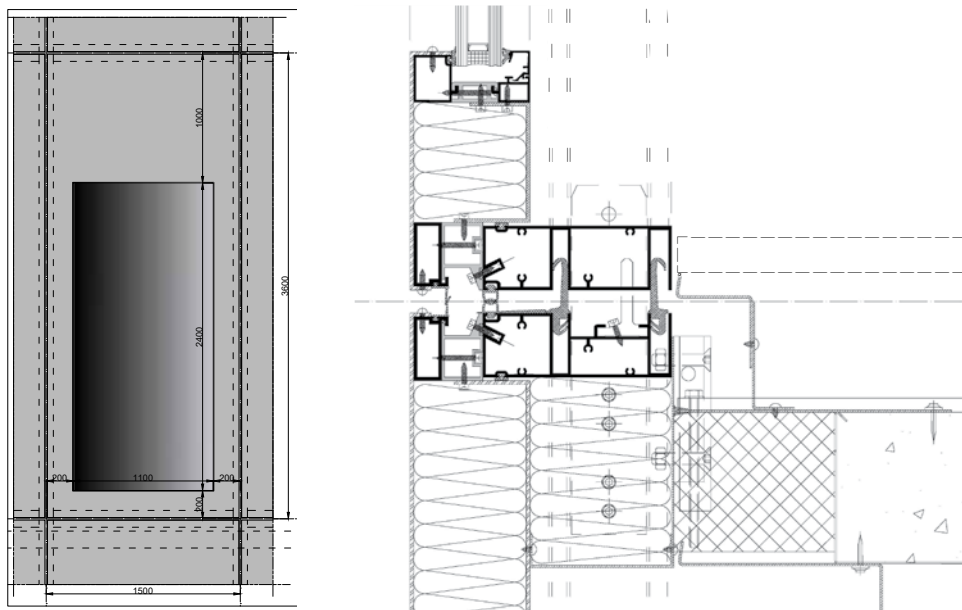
Type 1 elevation and vertical section detail n.t.s. (source: own image)
